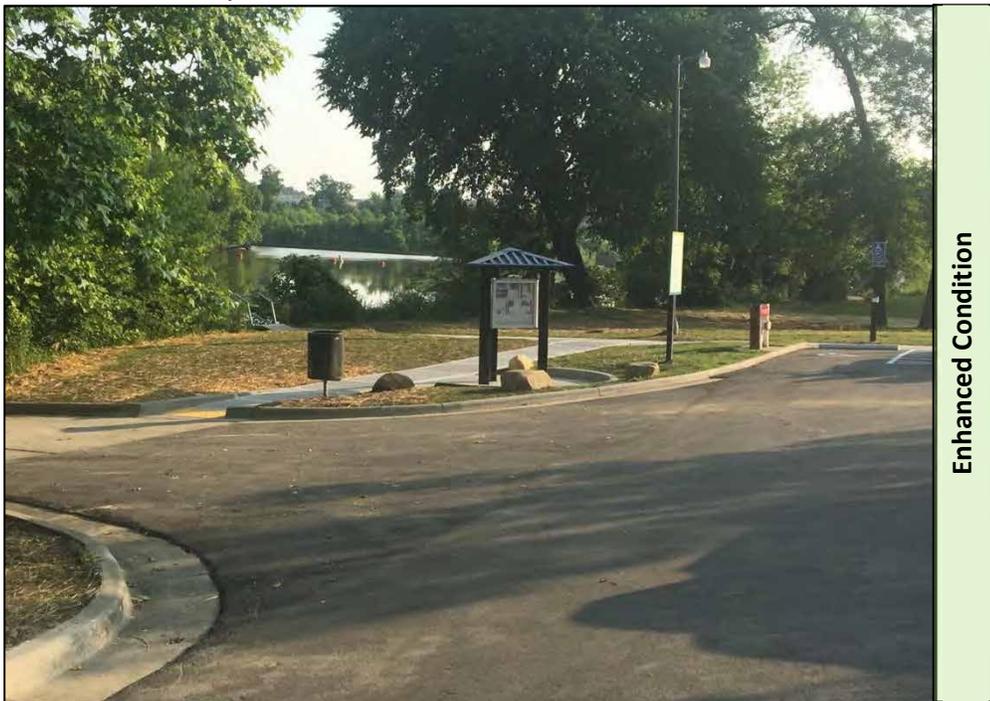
Added new accessible sidewalk leading to the kiosk and courtesy dock.
